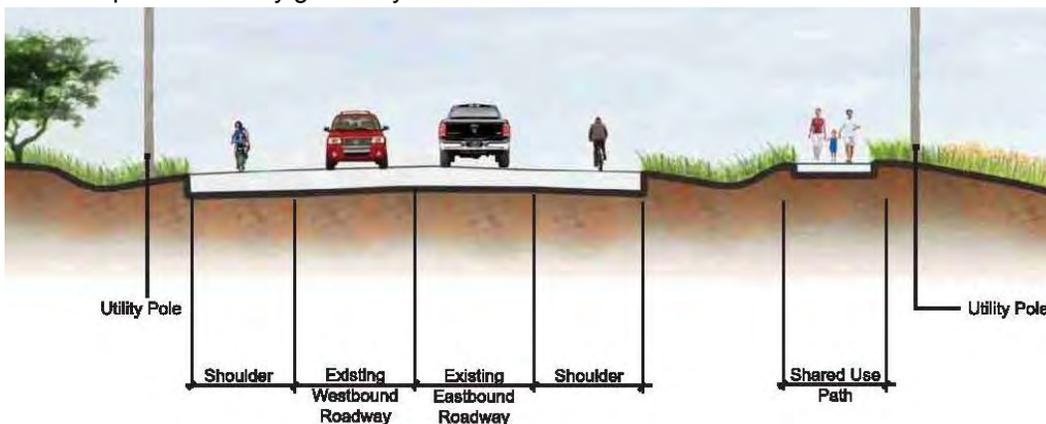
Alternative 2 Base Improvement Segment C Typical Section
